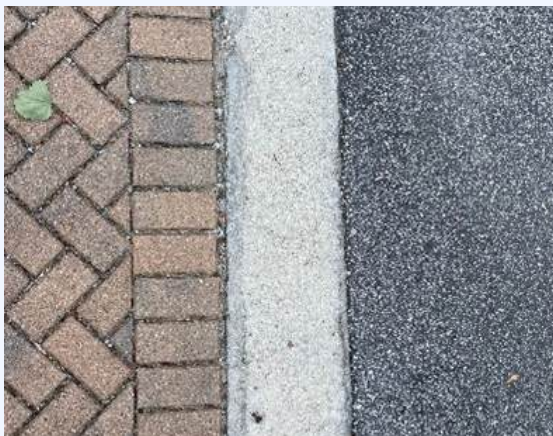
Concrete ribbon separates a permeable parking area from travel lanes, Mount Pleasant, SC.
